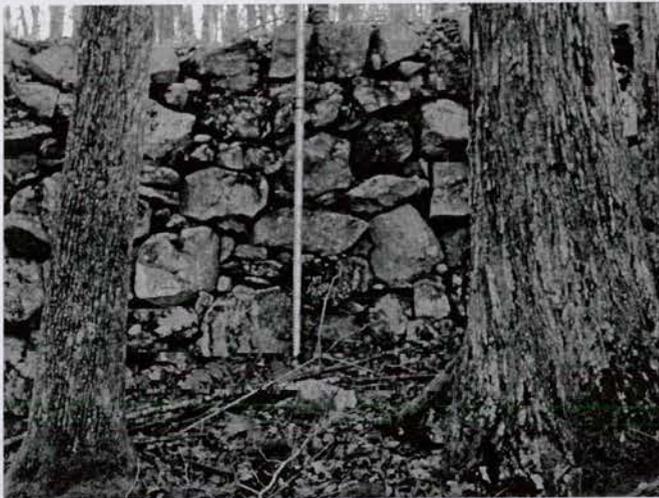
36-12-1-2005 London Bridge W wall, North to South, Section 6C View E
